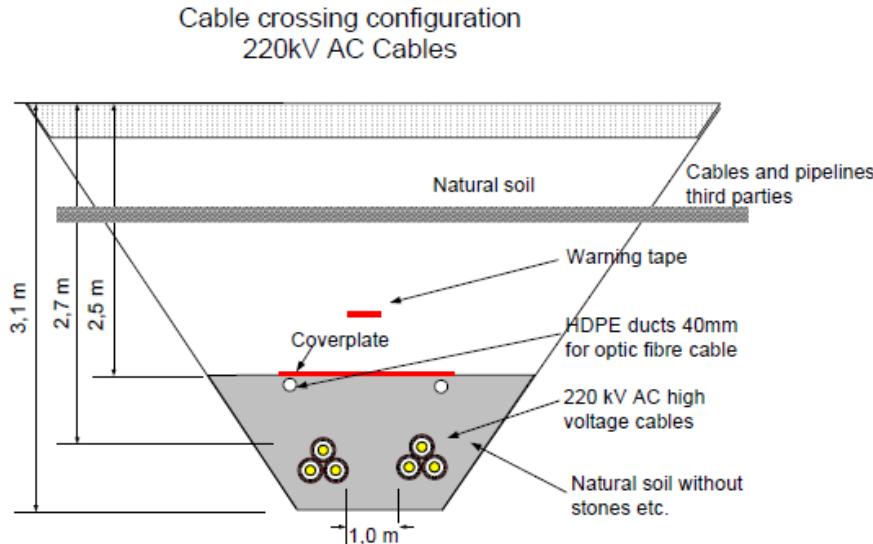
Cross view NorNed cable crossing HV cable trench Eemshaven
